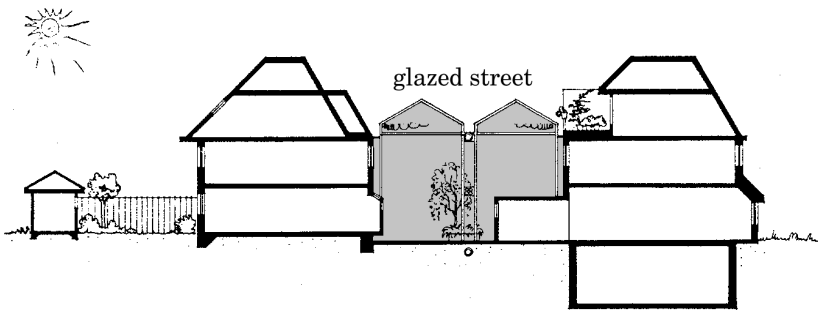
Section of the glazed street with surrounding residential buildings, Gårdsåkra. (Lange, 1986).
